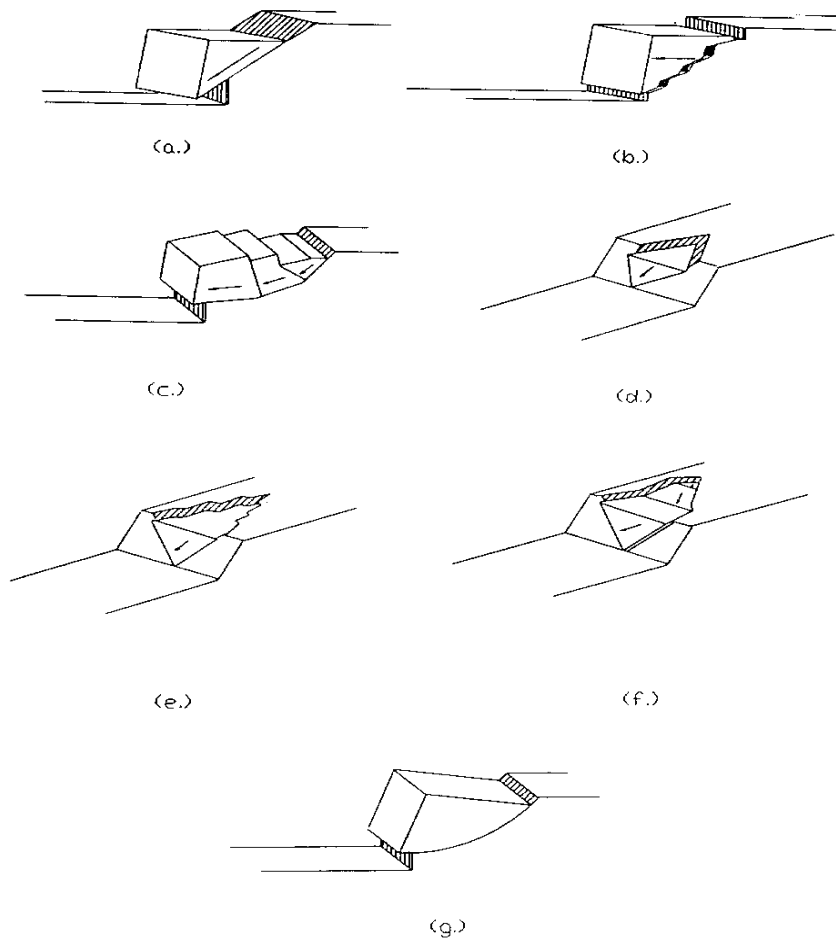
Failure sliding mechanisms (After Brown, 1994)
